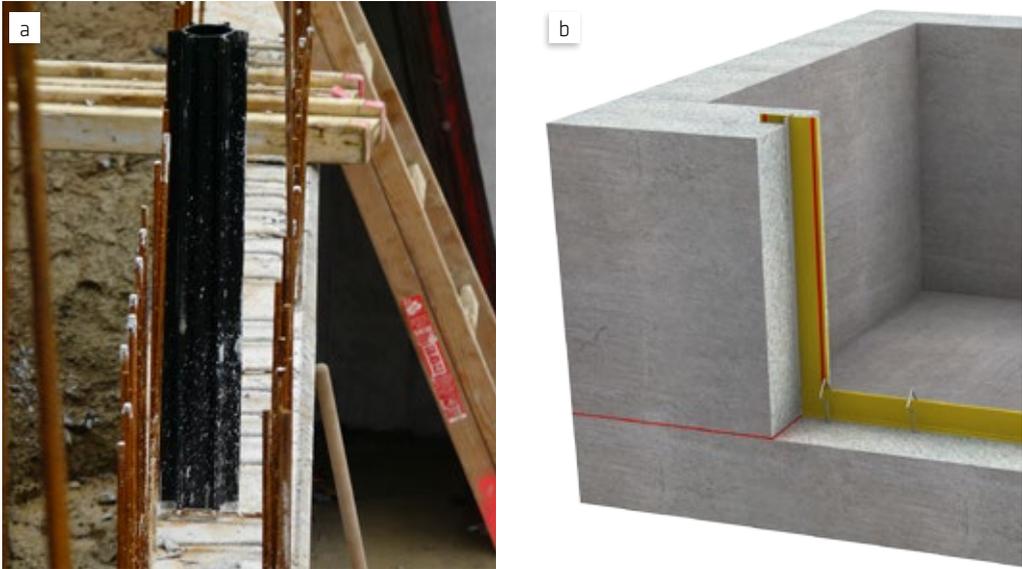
Crack inducers for forming controlled crack induced joints (a: controlled crack sealing tube, b: KAB 175 SR)
